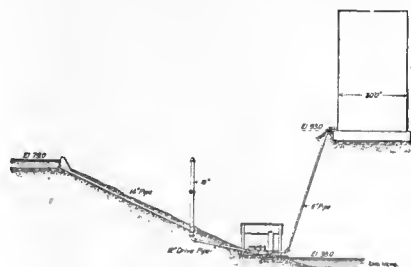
Hydraulic Ram and Connections U. S. Coaling Station, Narragansett Bay, R. I.
